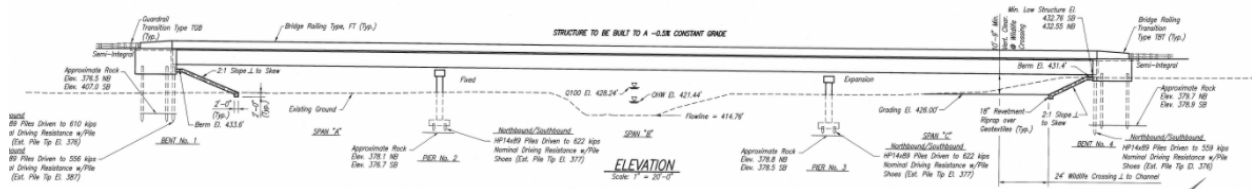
Elevation View of the Bridge (NBI 80182) (2010)
